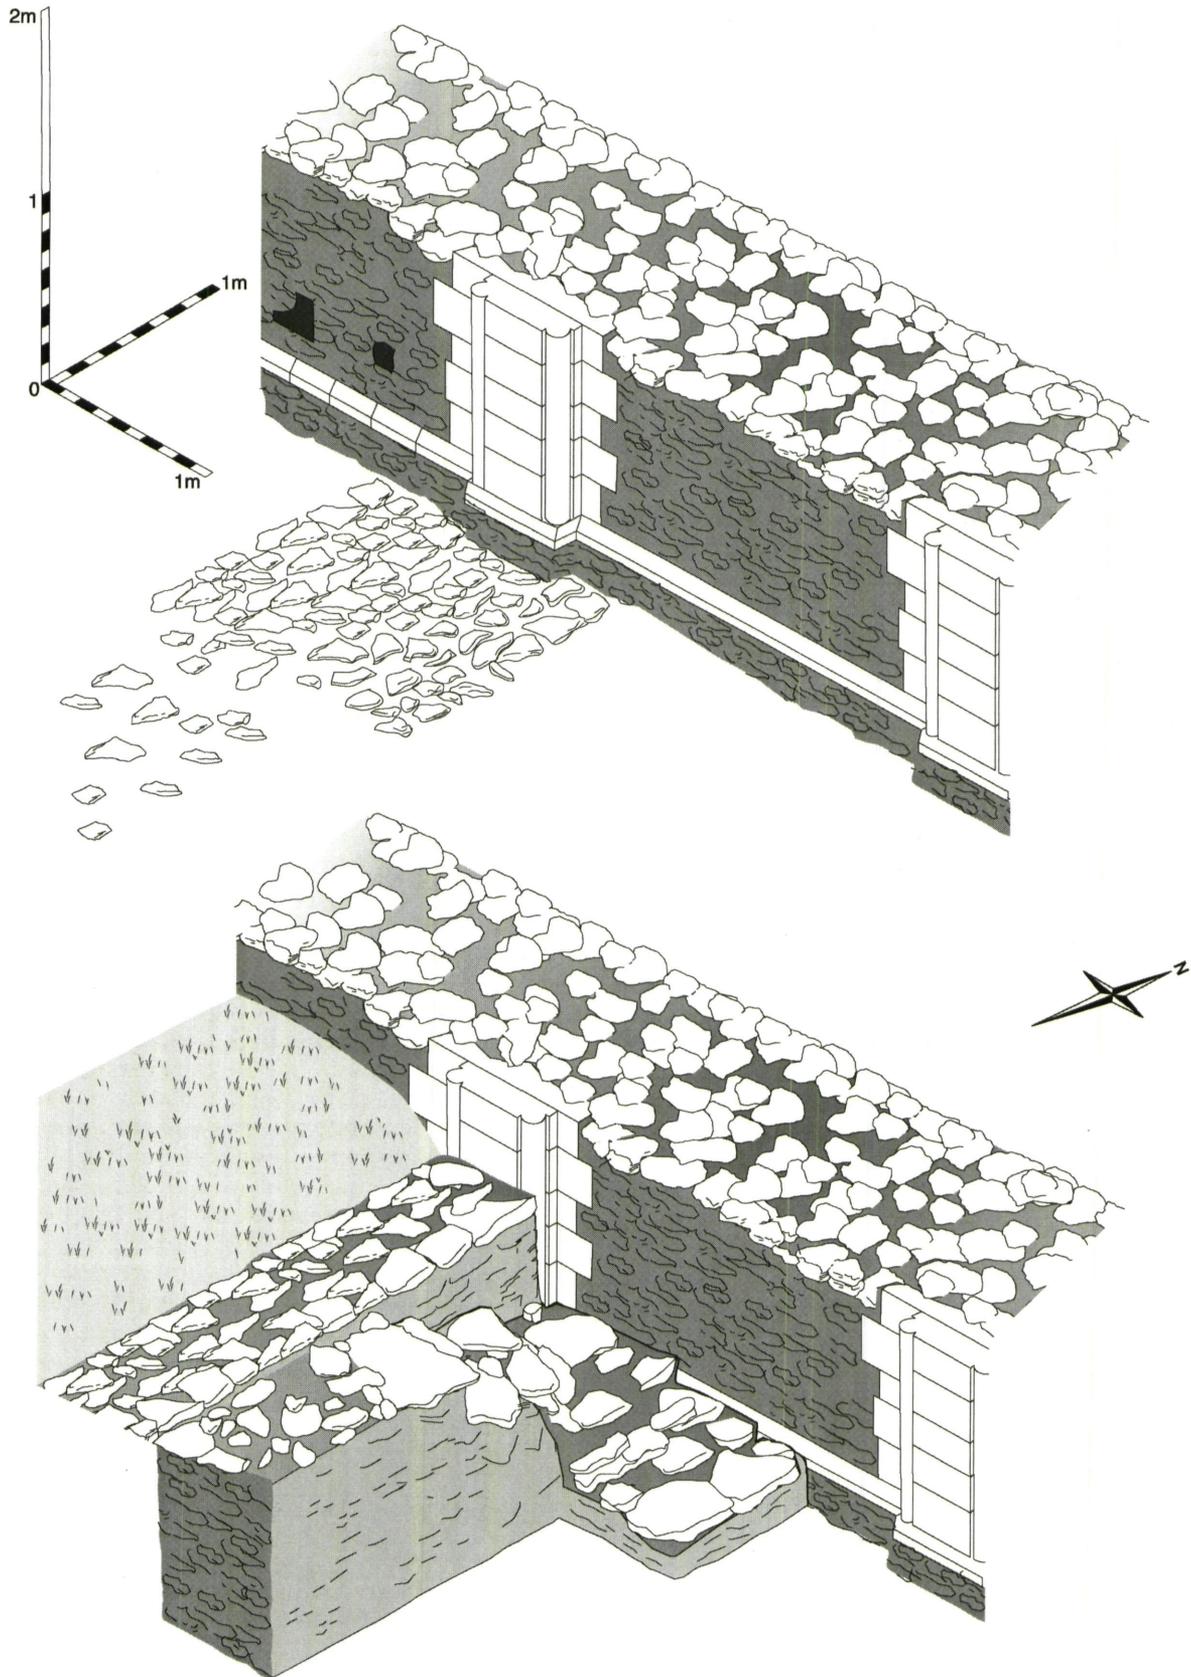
Isometric views of the south chapel wall and stair to terrace.
